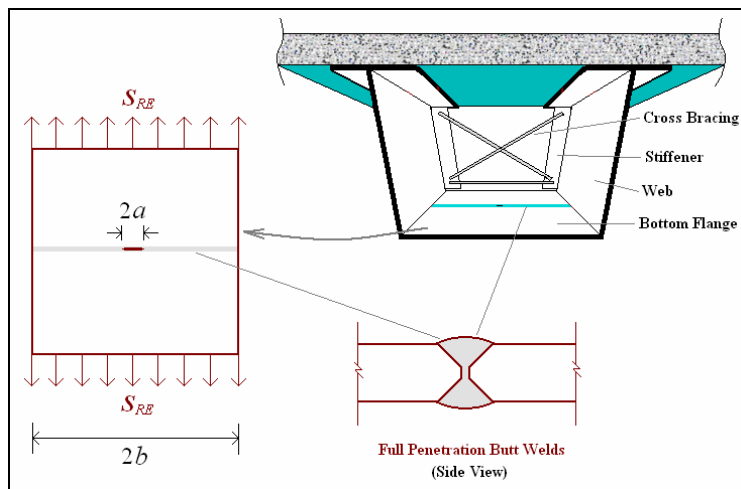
Center-Notched Crack in the Box Girder Bridge Example.
